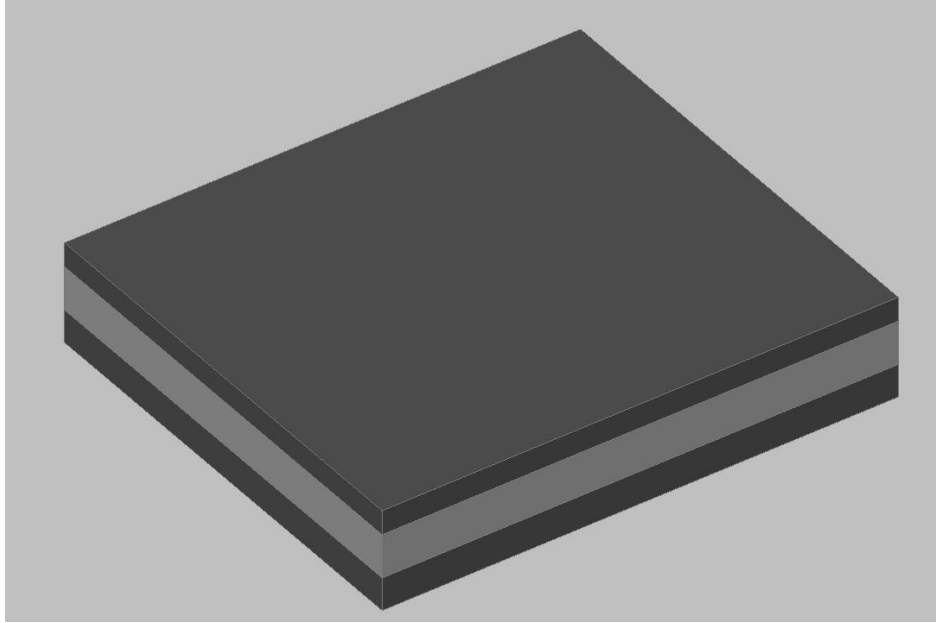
Chart. Three dimensional view of the Assembly Design VIII.
